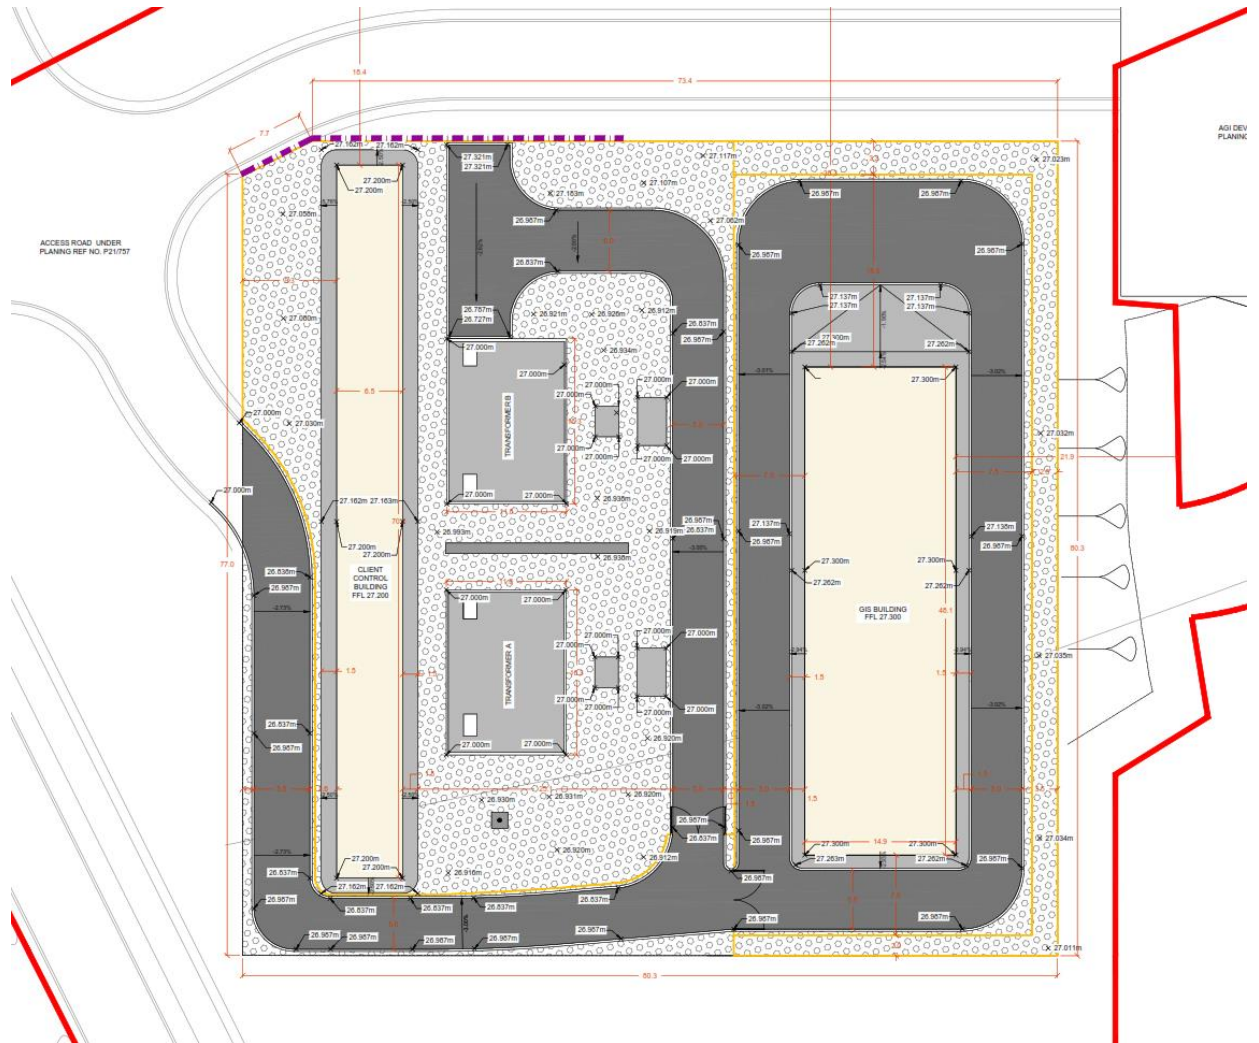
Proposed New Substation Arrangement (Source CSEA Consulting Engineers)
